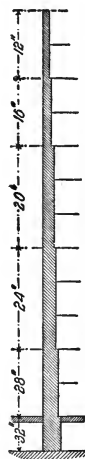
Diagram of Wall Thicknesses for Other than Skeleton Construction.
